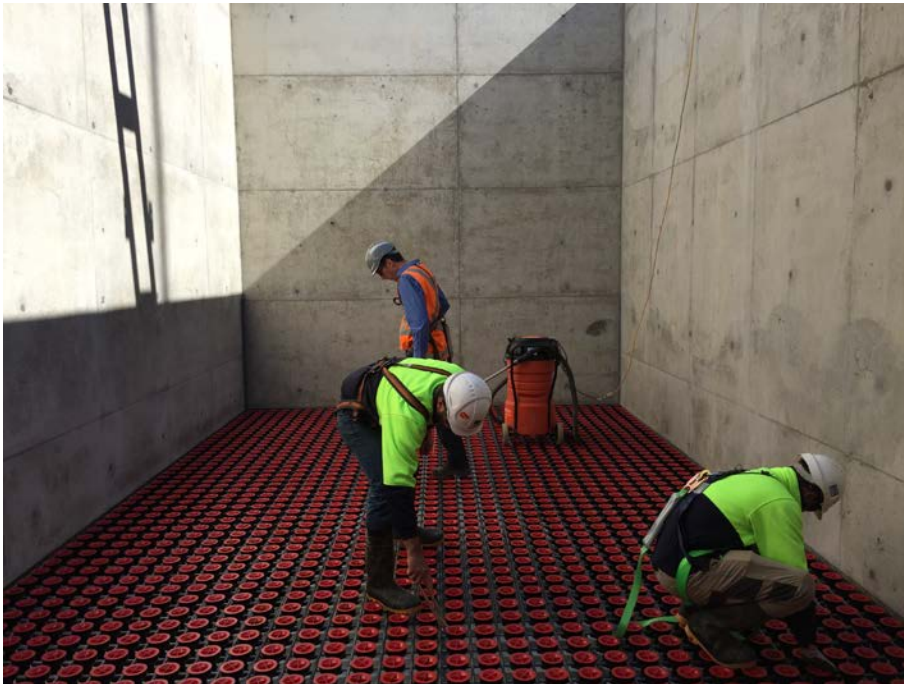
Filter k-floor nozzles final inspections prior to pouring
